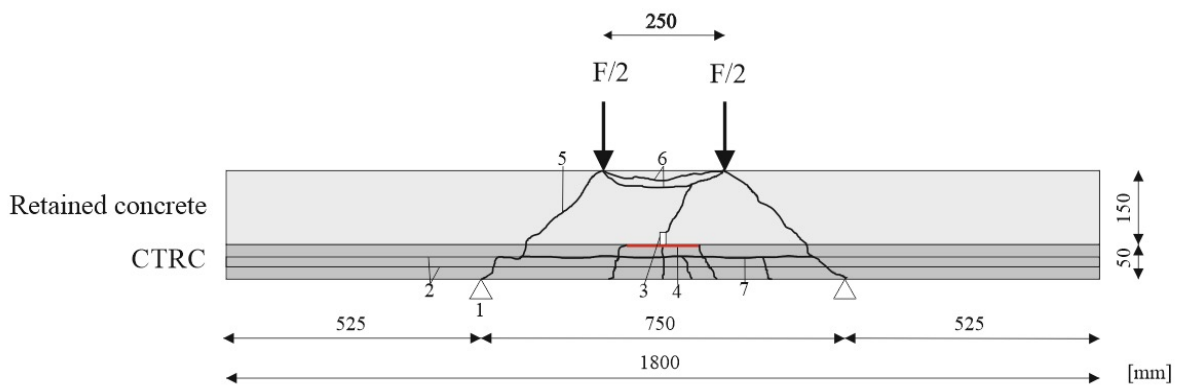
Example of crack pattern. 1: bearings, 2: carbon textile reinforcement layers, 3: joint, 4: bond breaker, 5: shear cracks, 6: horizontal cracks, 7: delamination.
